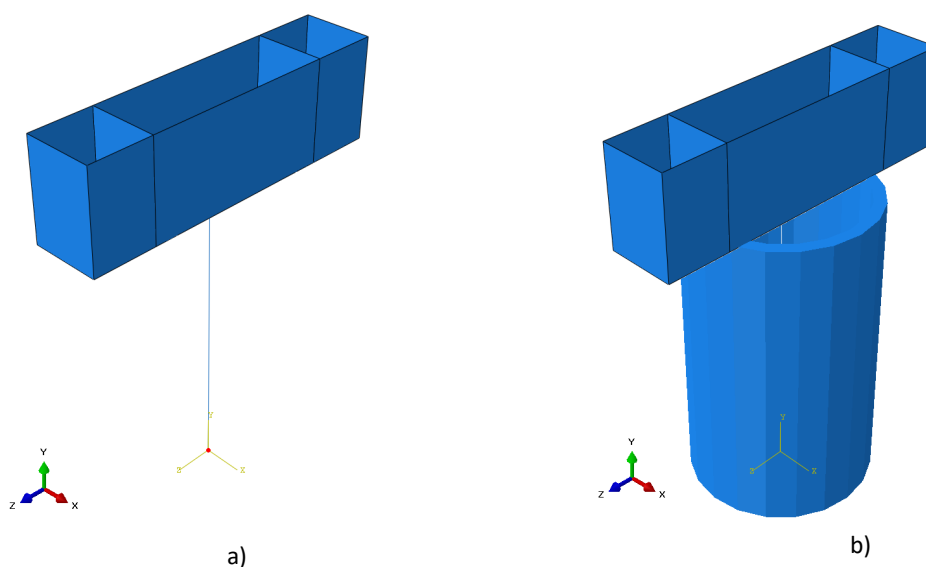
a) Modelled geometry of the simplified containment structure. b) Rendering of the cross-sectional shape of the beam element resembling the containment wall.
